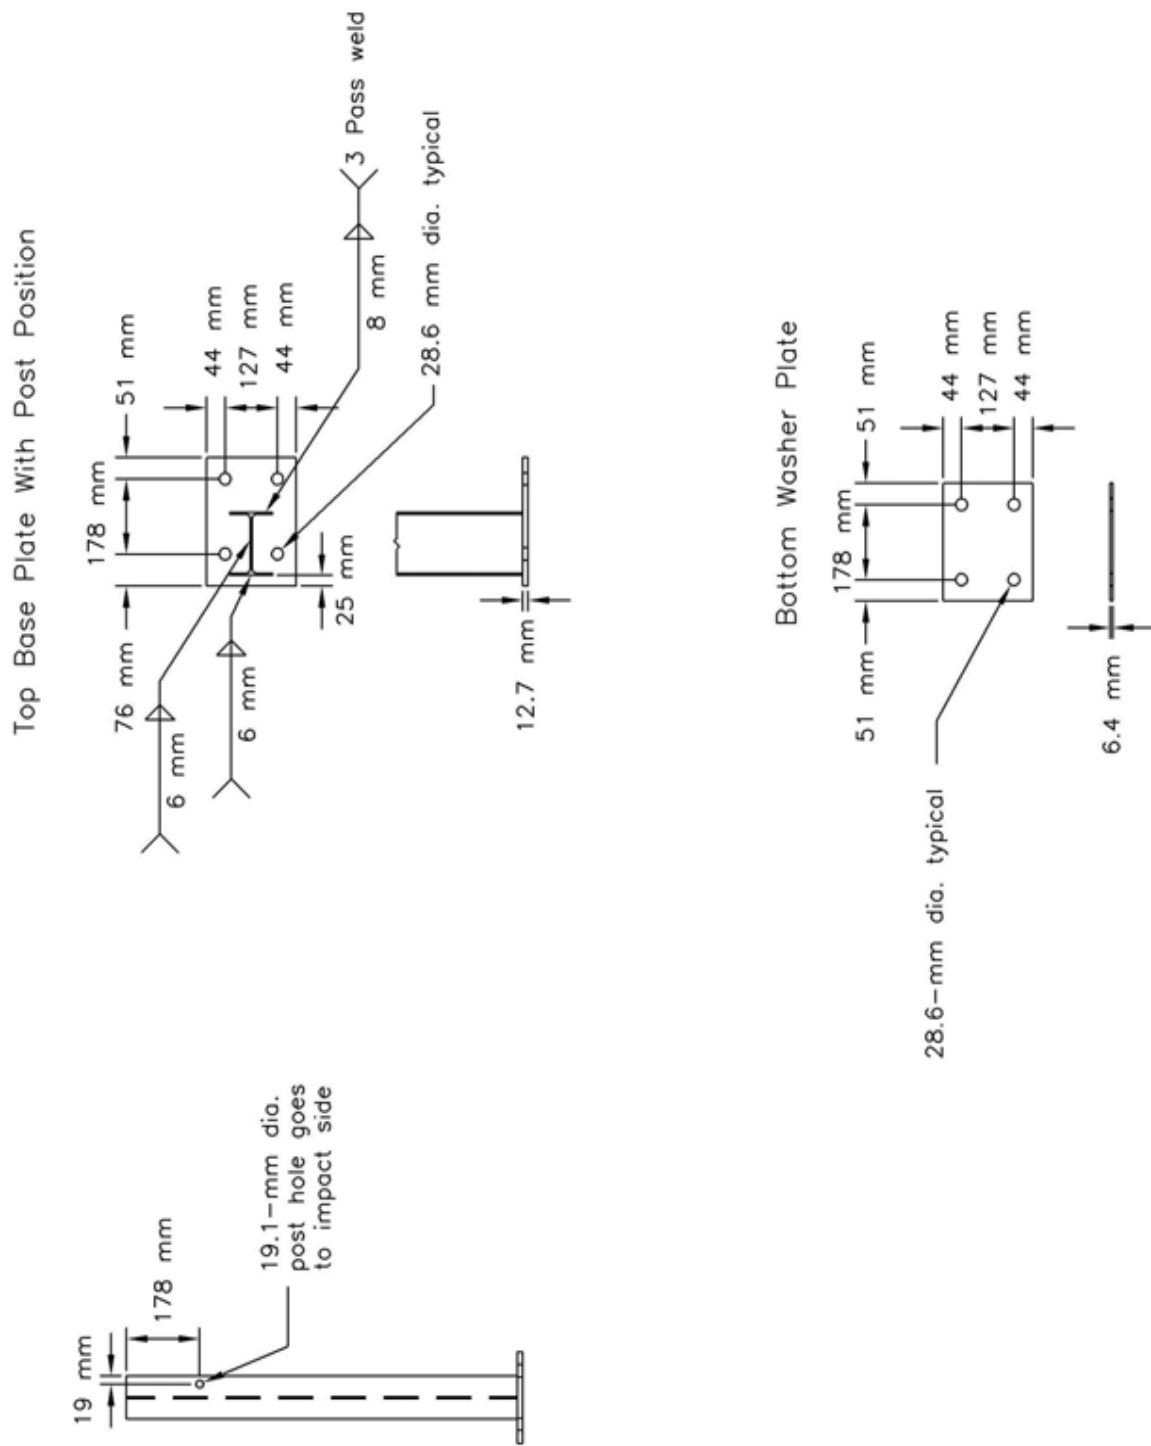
W-Beam Guardrail Attached to a Low-Fill Culvert (Option No. 1)
